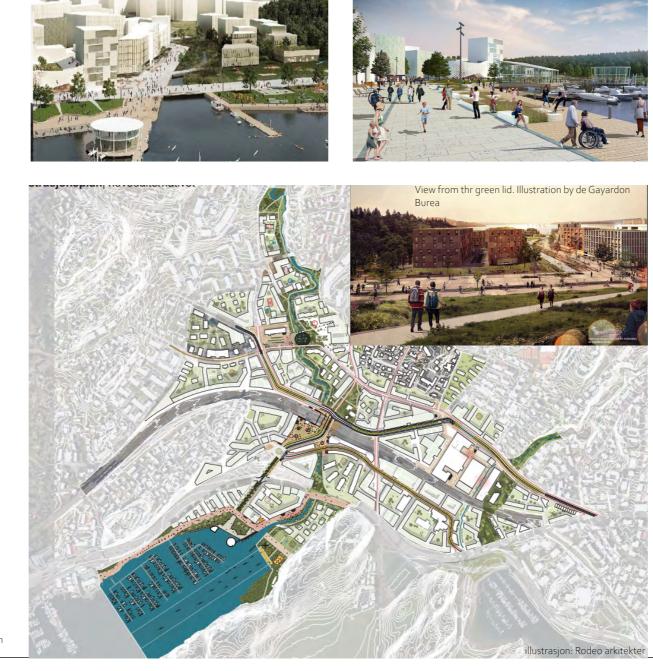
Main proposal Site rezoning. The plan shows that the area of E18 is taken out of the plans due to innsigelse from Statens vegvesen. (Ibid)
